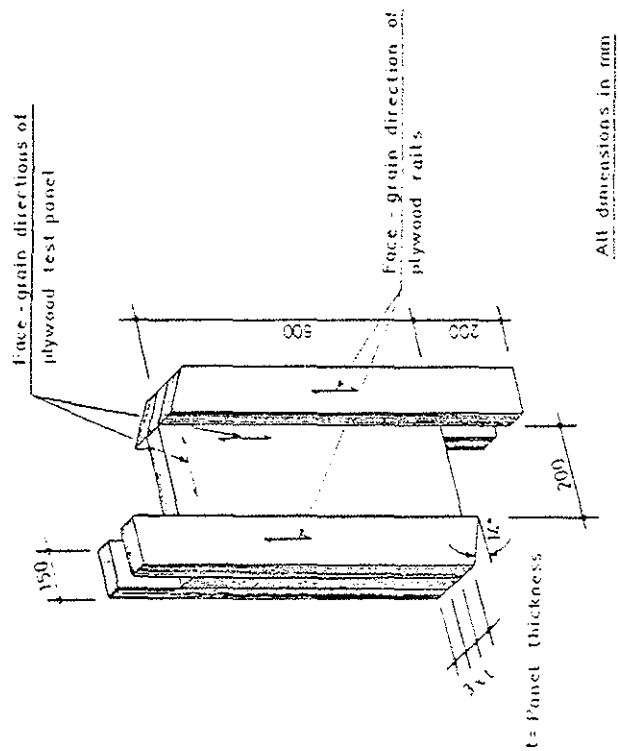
Modified Test Specimen with Plywood Rails of Same Thickness as Test Panel
